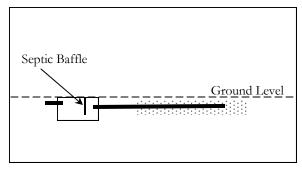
B. (Side View) Septic Tank and Precast Concrete Block-Trench System.
